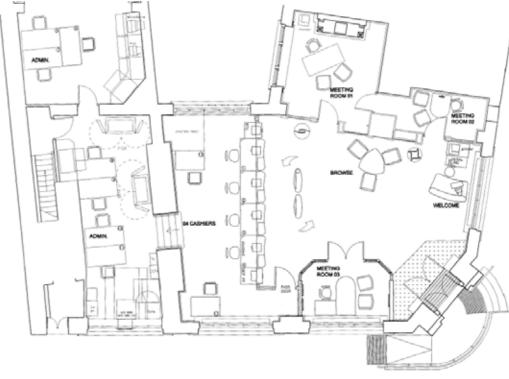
2004 Proposed ground floor plan, Planning Ref. 2004/4314/L
